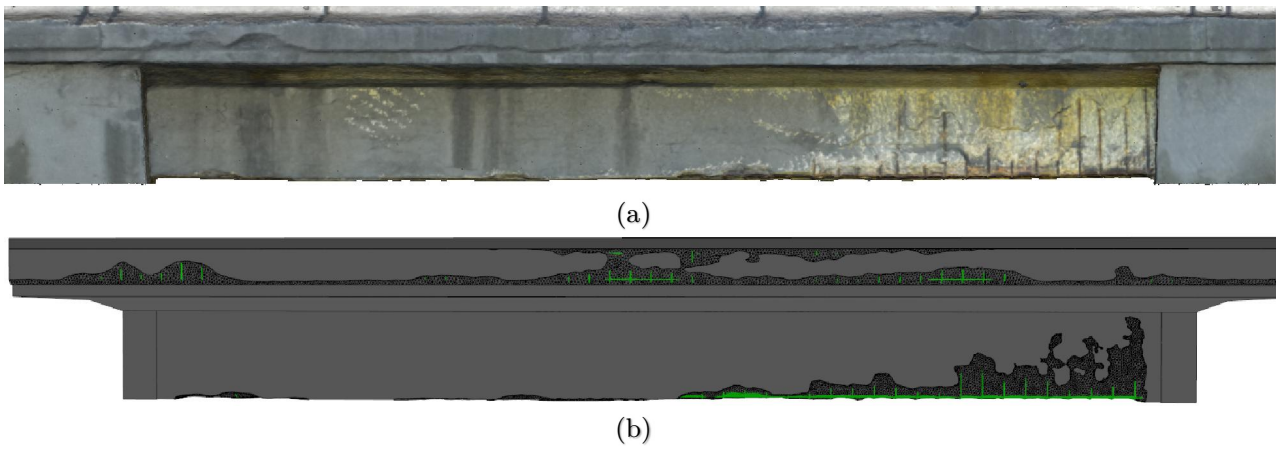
East girder and curb of the bridge: (a) photogrammetry-based triangular mesh, and (b) the as-is IFC with spalling damage geometry.
